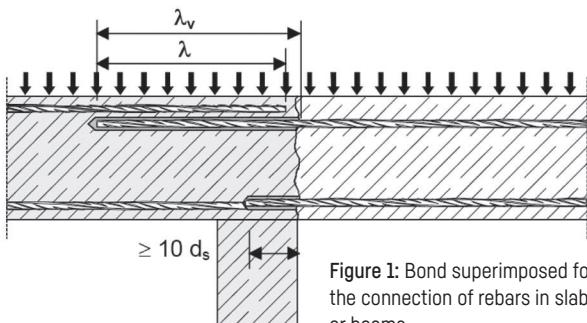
Bond superimposed for the connection of rebars in slabs or beams.
